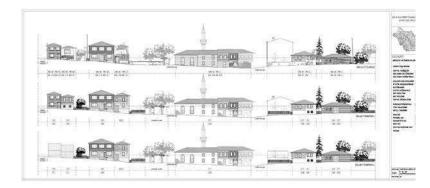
Silhouette 1 Cami Street North Facade Proposal (*Drawing: Aydın, 2017*).
